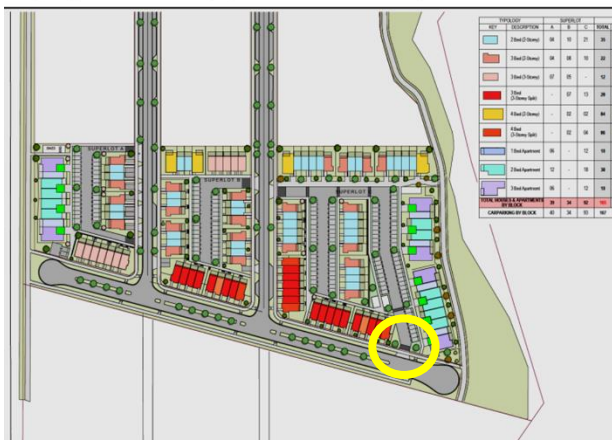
Residential development at 125 Murphys Road showing JOAL on Road 3.
